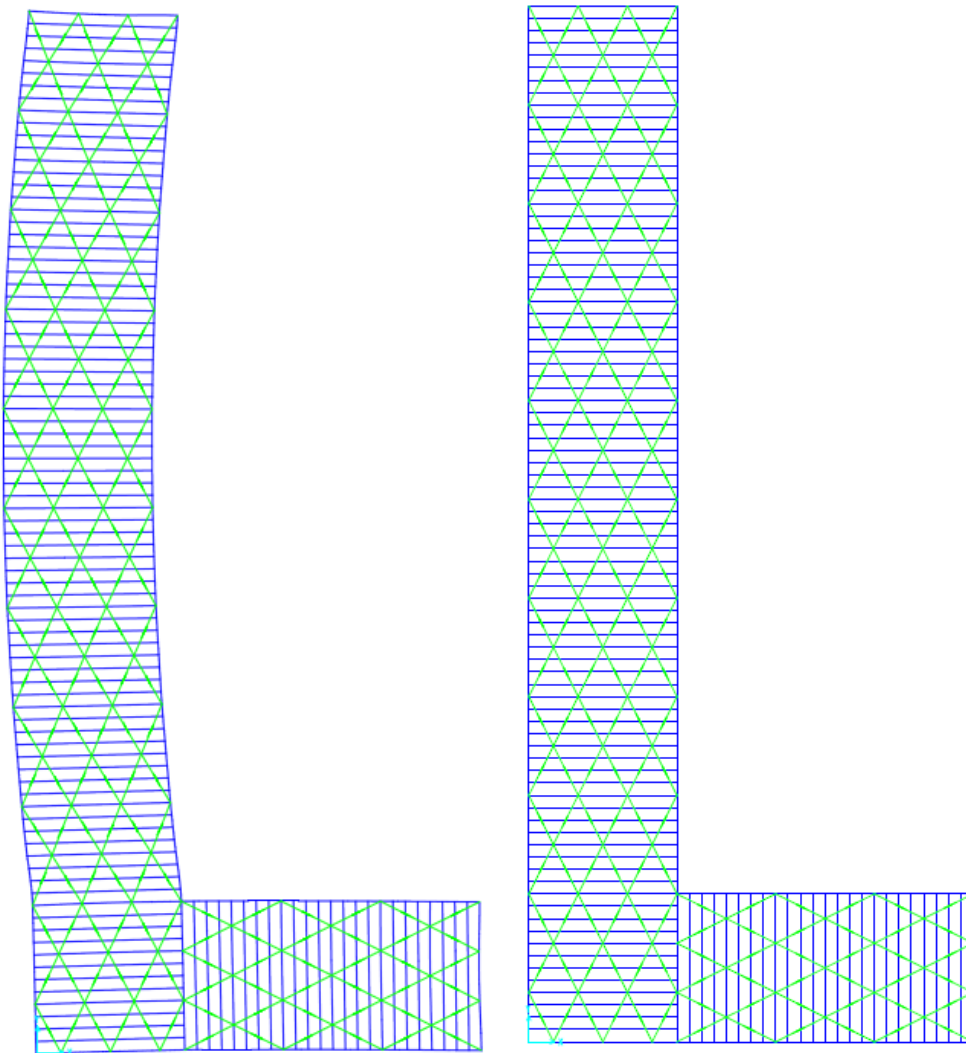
Deformed shape verses undeformed shape of 300% model
